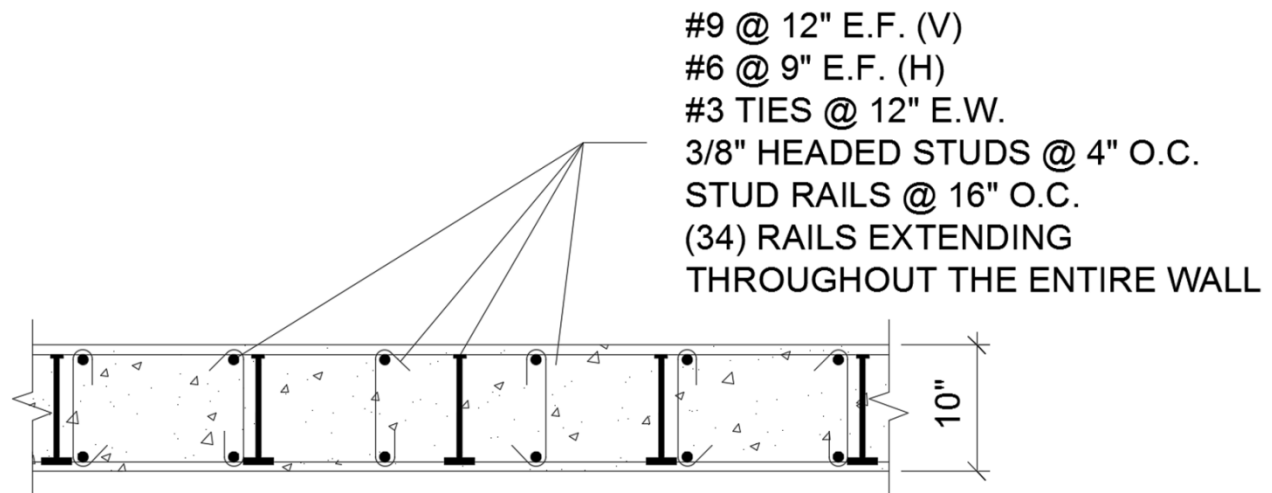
New exterior wall, cross-section at the ground floor level based on tsunami design requirements.
